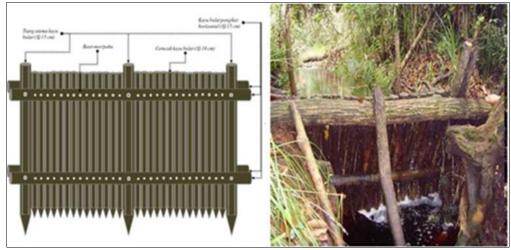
One layer bulkhead type without overflow (non-spillway) (Photo and illustration by: Alue Dohong)
